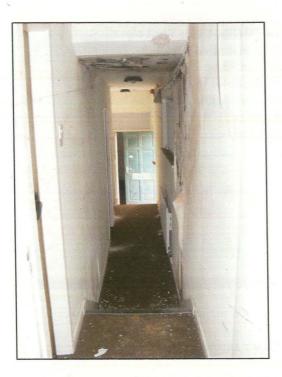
(Shot 27): Corridor along west side of bungalow, looking south. Note the steps down into each of the three sections of the building.
